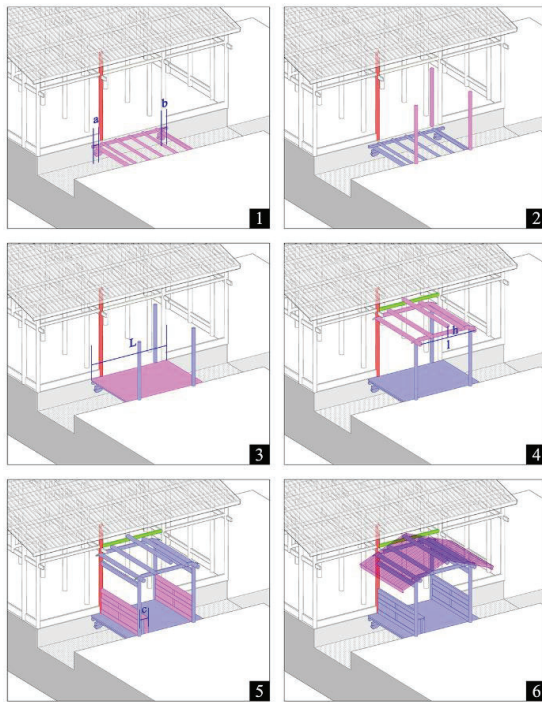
Construction process and technical key points of Over-canal roofed bridges
